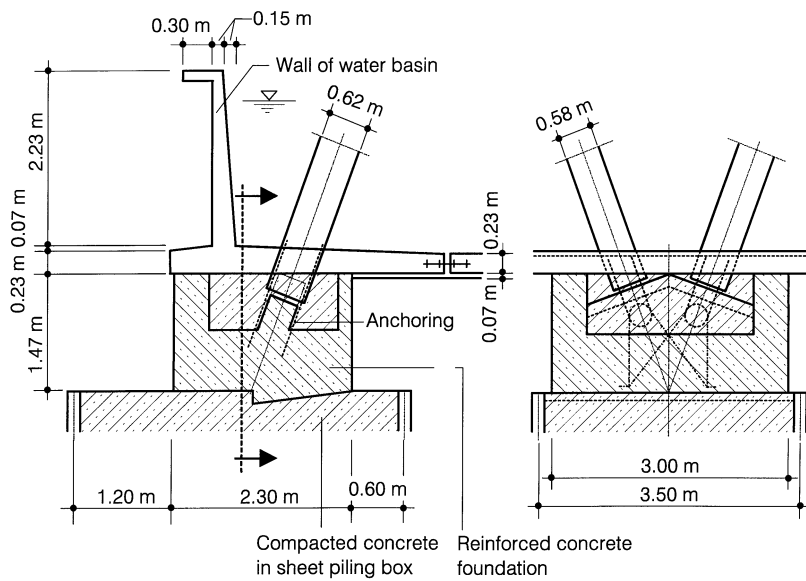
Individual reinforced concrete foundation on concrete base.
